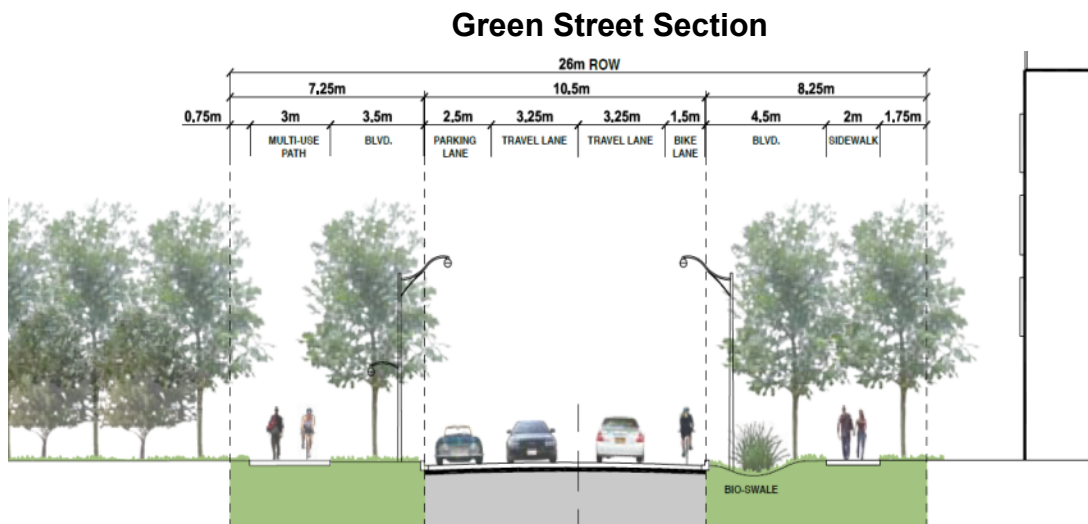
Green Street Typical Section (Source; Michele, 2011)
